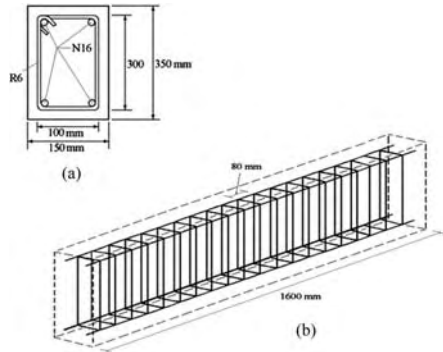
Assumed: (a) cross section, (b) layout of the reinforcements.
